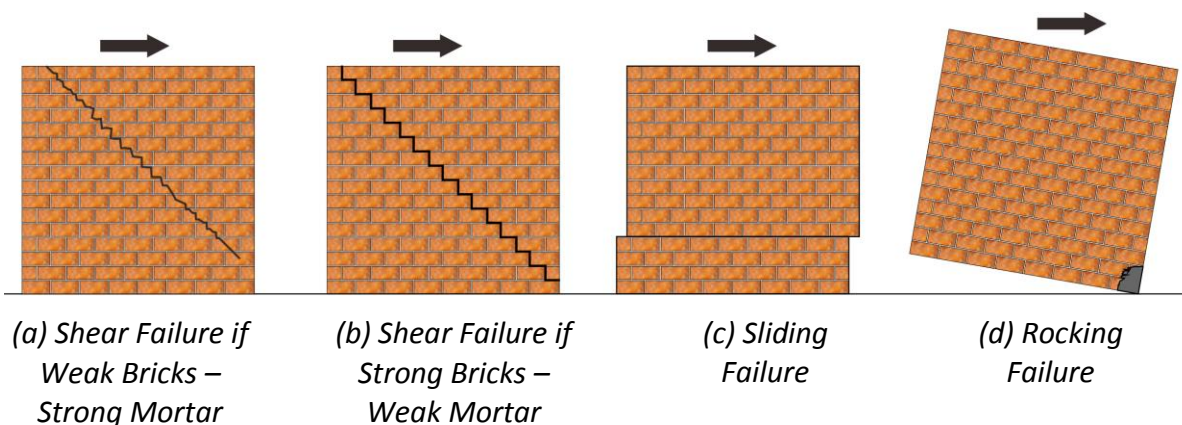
In-Plane Failure Mechanism of Laterally Loaded URM Wall
